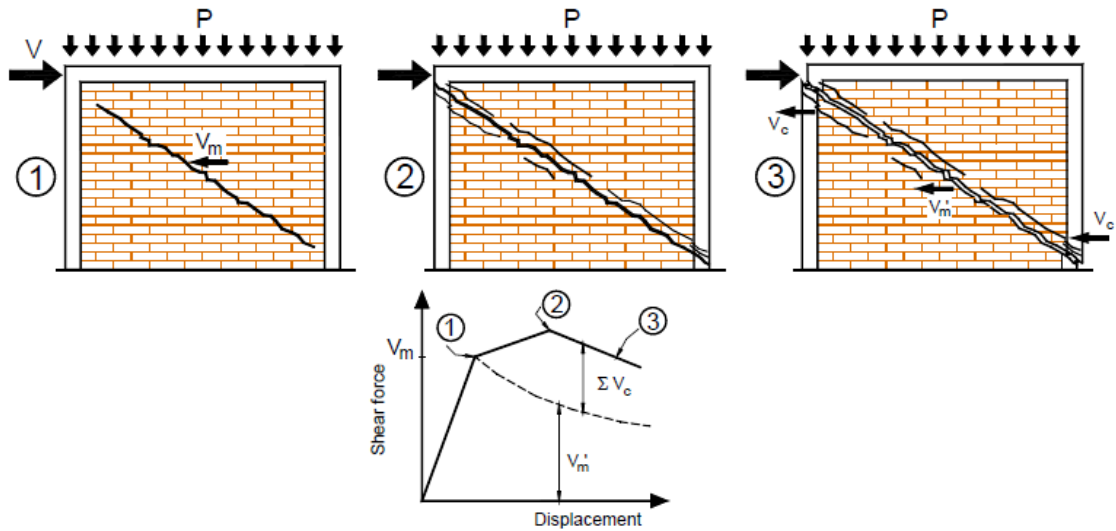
Mechanism of shear resistance for a confined masonry wall panel: 1) diagonal cracking in the masonry wall; 2) diagonal cracks have propagated from the wall into the tie-columns, and 3) shear failure of the RC tie-columns and the confined masonry wall panel (Meli, 2011)
